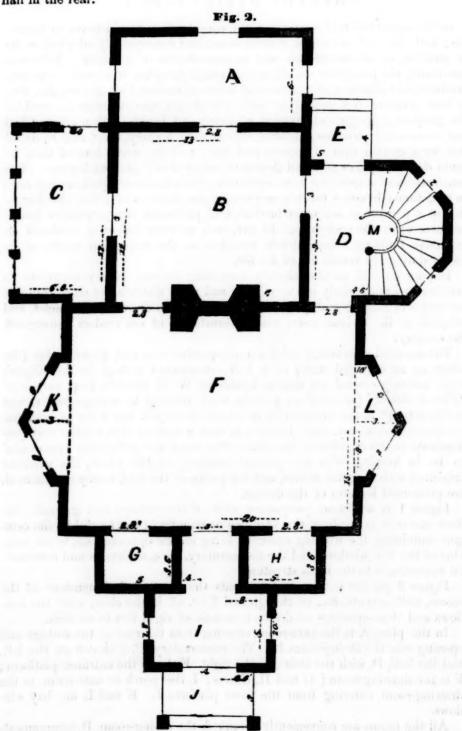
(on the next page) represents the plans and dimensions of the rooms, halls, closets, &c., of the ground floor, all in the clear, with the windows and door-openings all drawn to a scale of eight feet to an inch.
